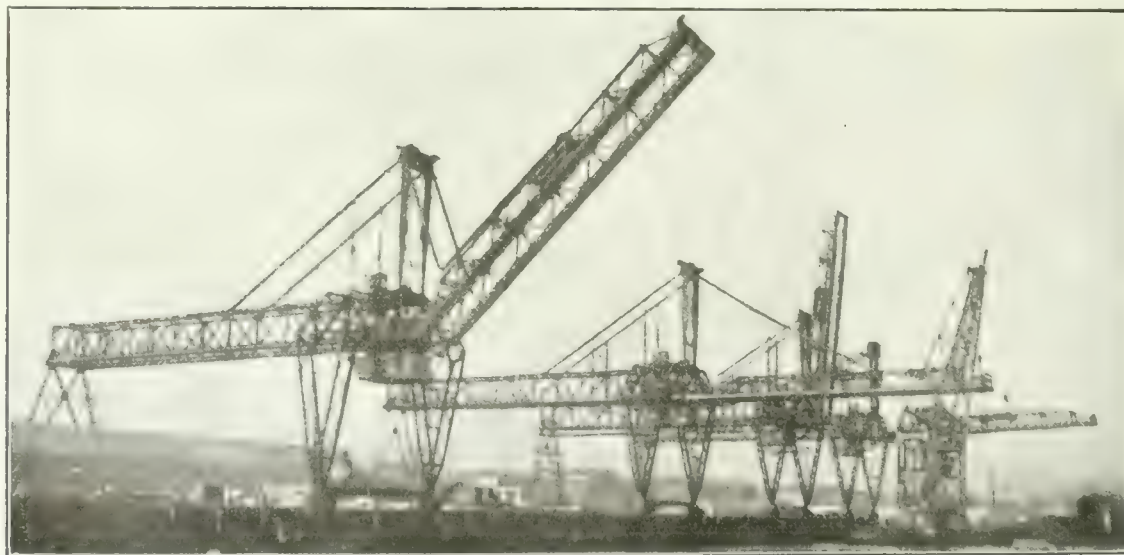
Loading Plant with Bridges of 160 ft. Span and 90 ft. Cantilever.
